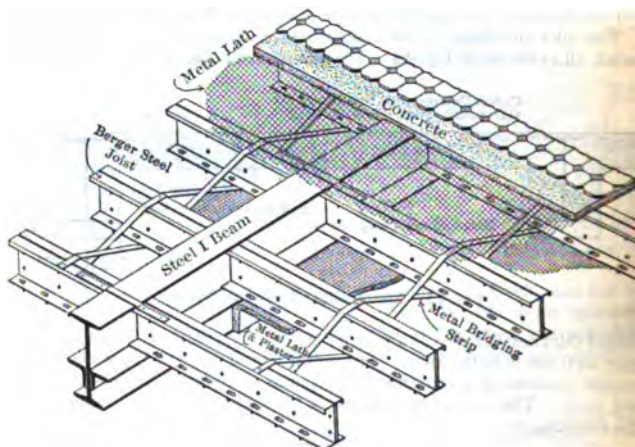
Berger's Metal Lumber and Concrete Floor-construction
